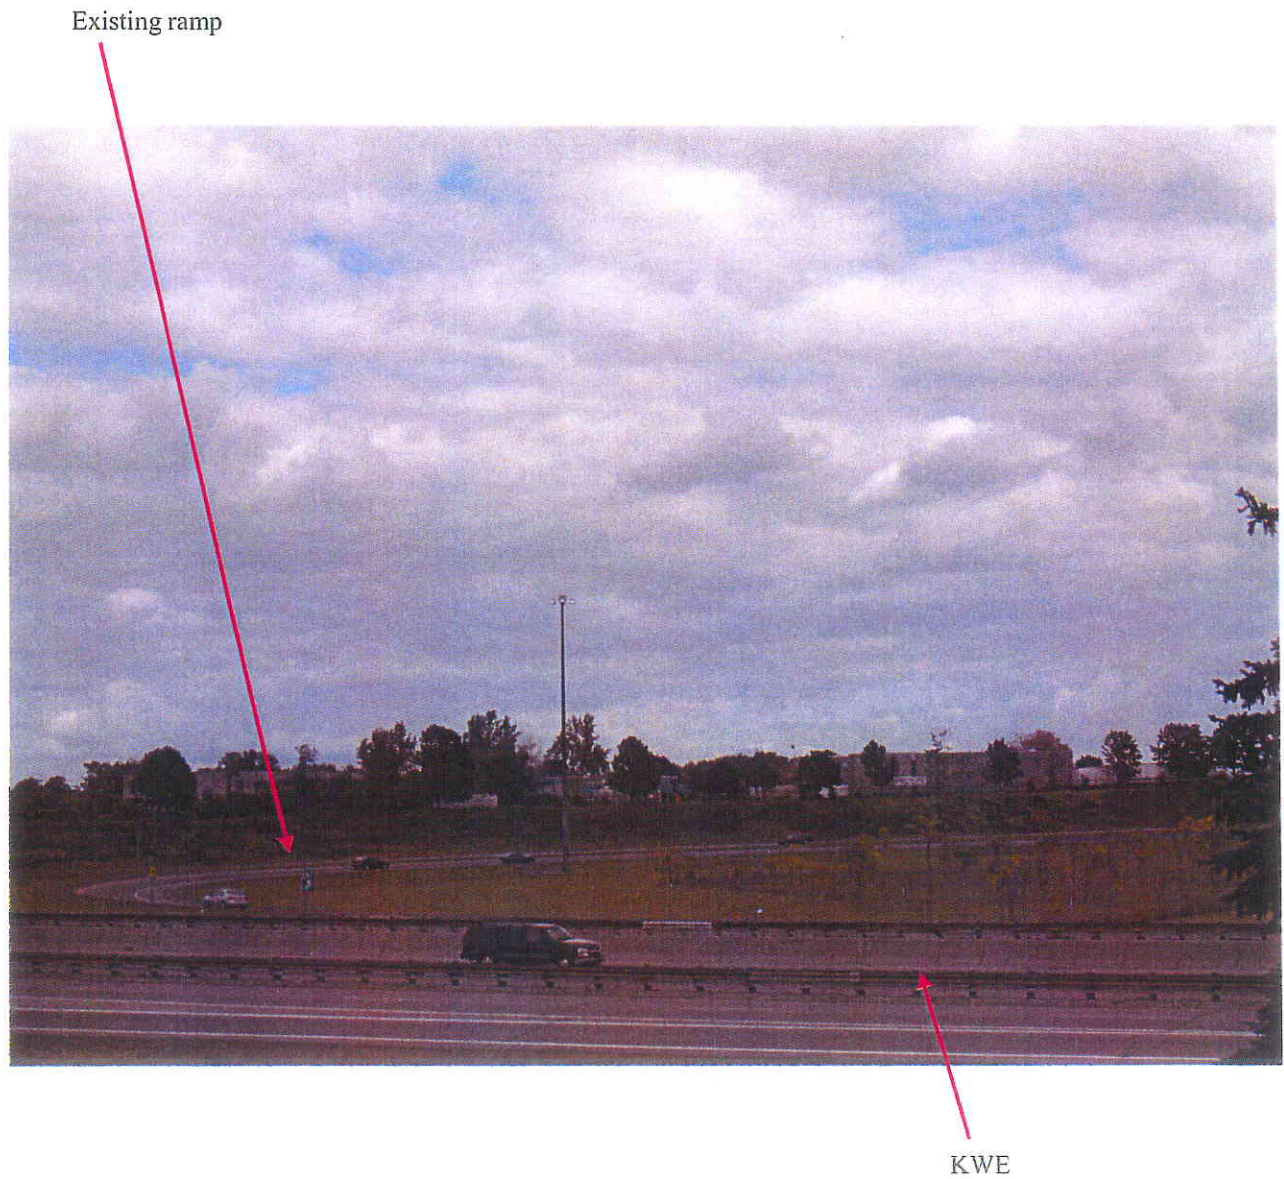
Looking at the northeast quadrant of Wellington Street and KWE interchange.
